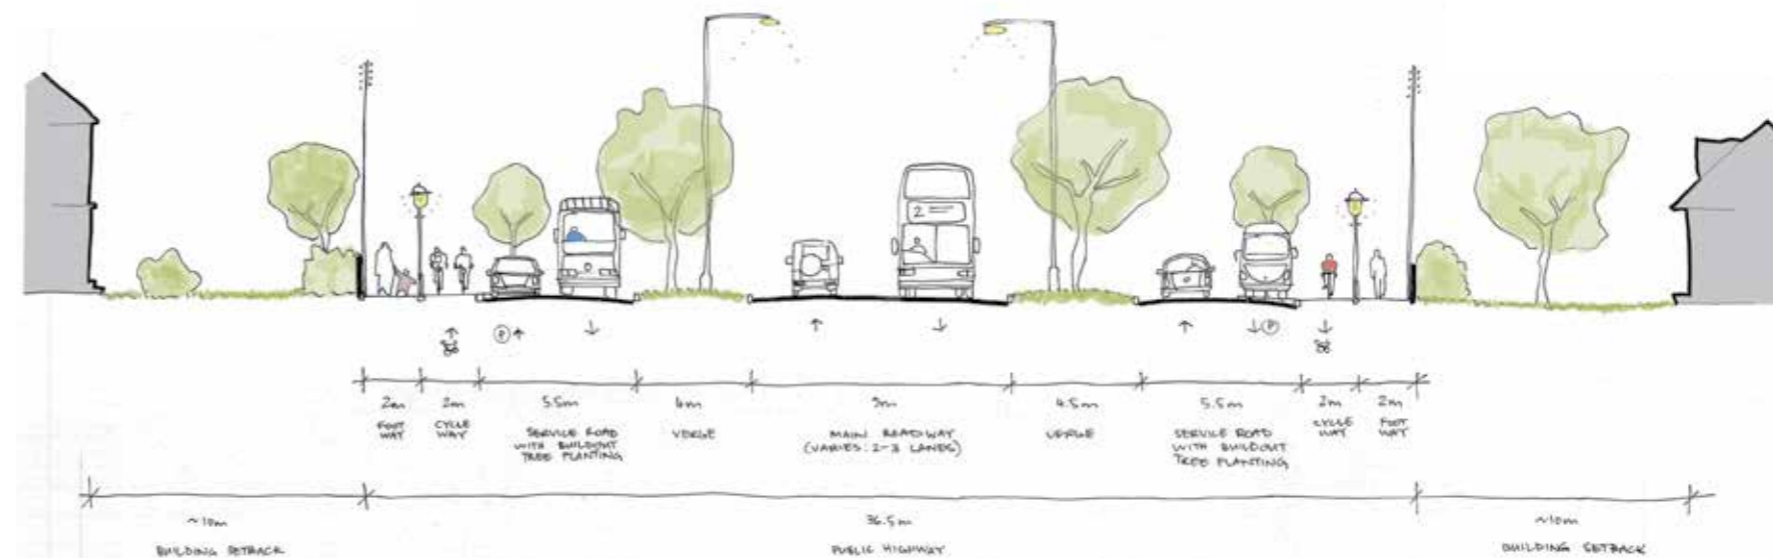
Potential improvements- Southern Oxford Road- view north
